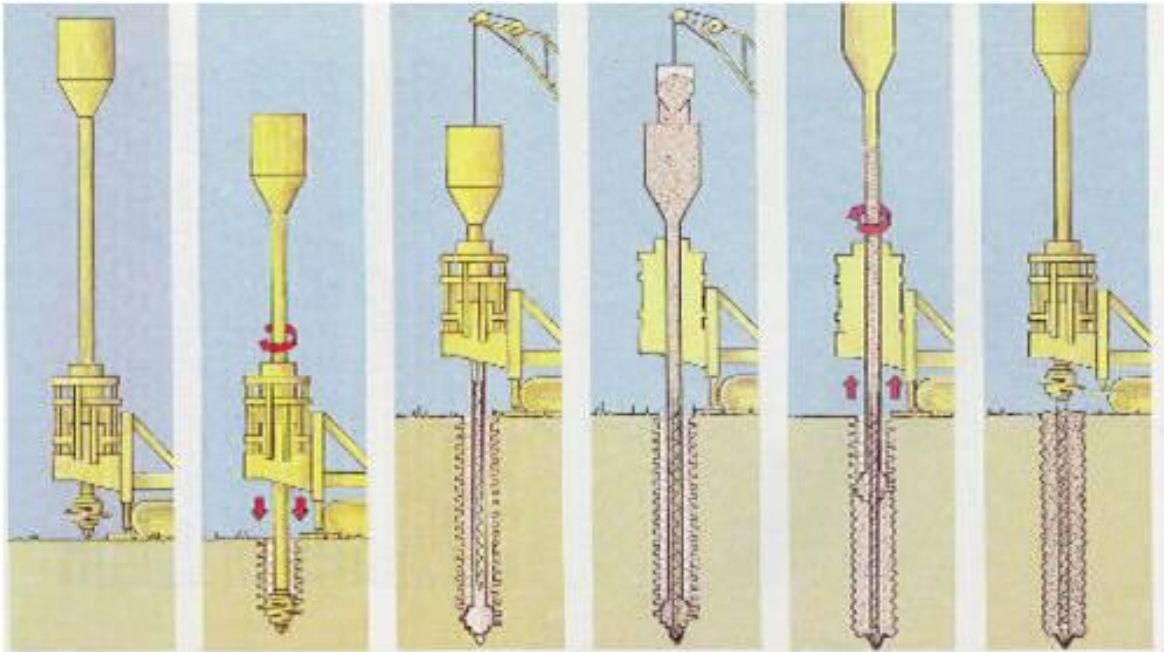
Typical installation process of an Atlas pile, after Franki SA nd
